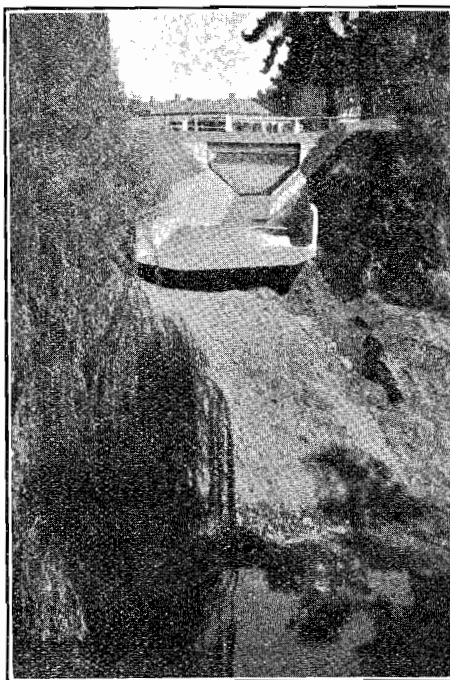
Outfall Structure, Kennedy's Gully Drain, Bacchus Marsh.
